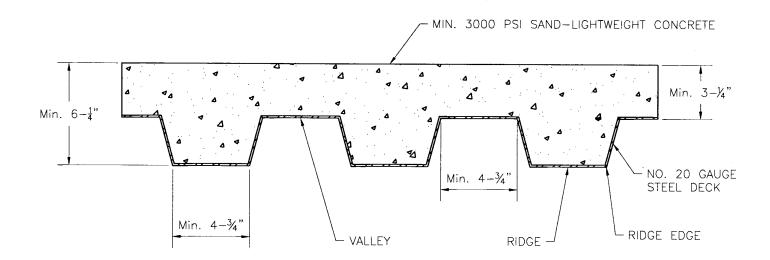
PROFILE OF SAND-LIGHTWEIGHT CONCRETE OVER METAL DECK
